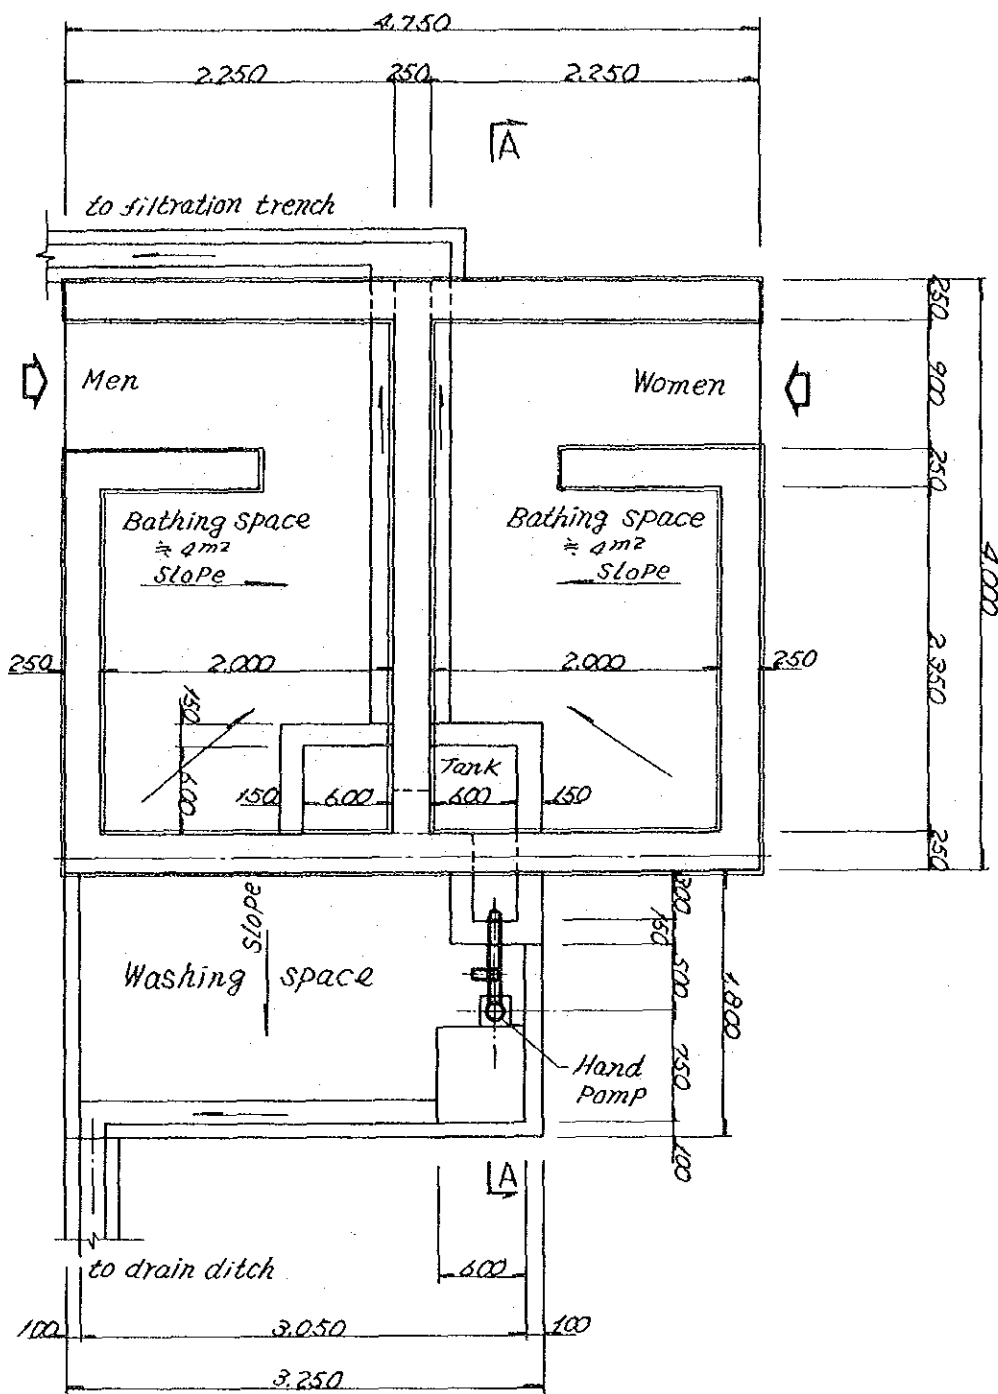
TYPE-A FACILITY-PLAN S=1/50
